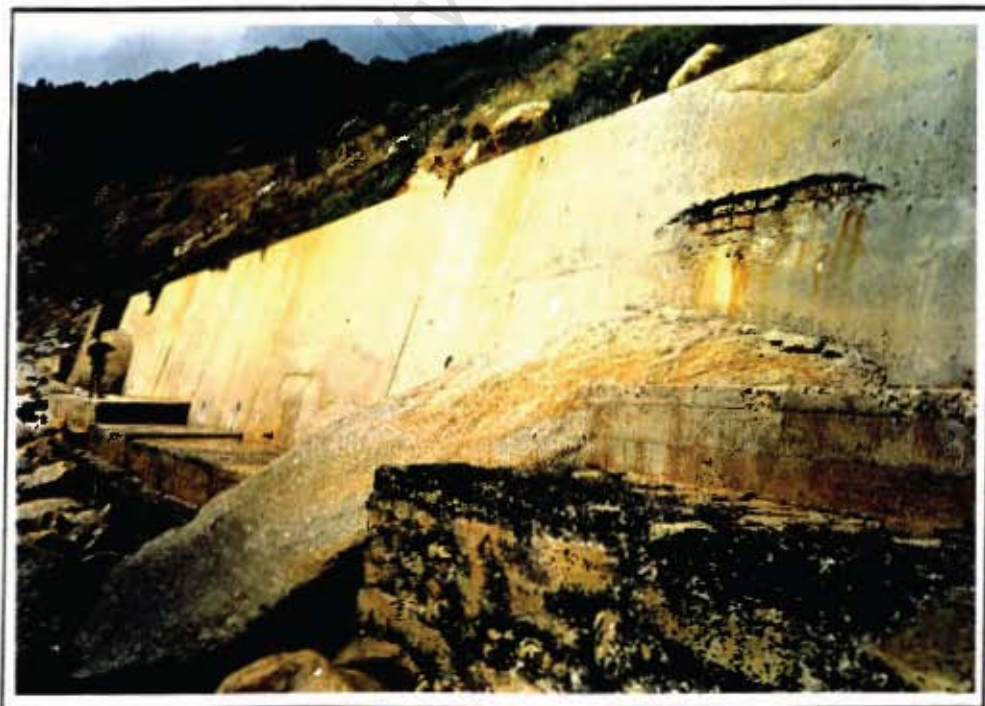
Evidence of Corrosion Damage on Retaining Wall
